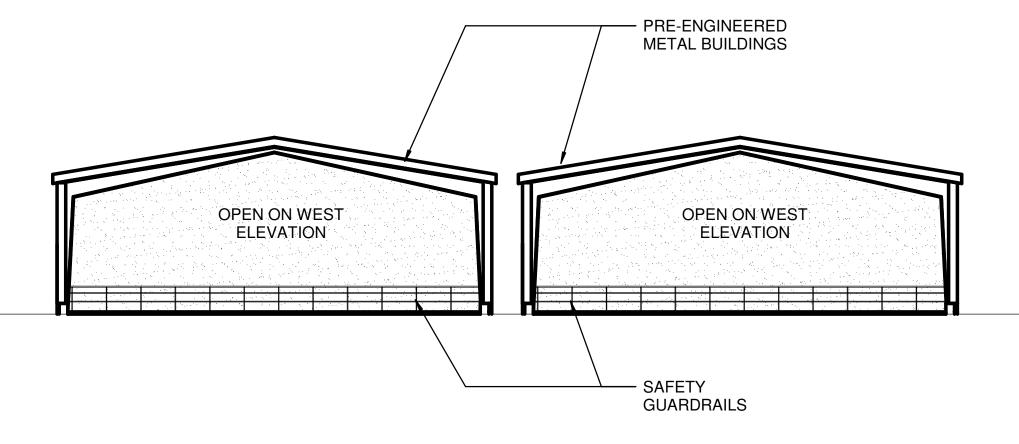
REMOTE SELF HAUL WEST ELEVATION
